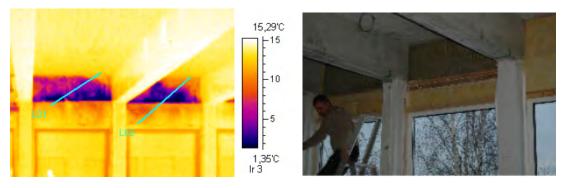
thermal camera image showing are leakage between the concrete elements and surrounding constructions
